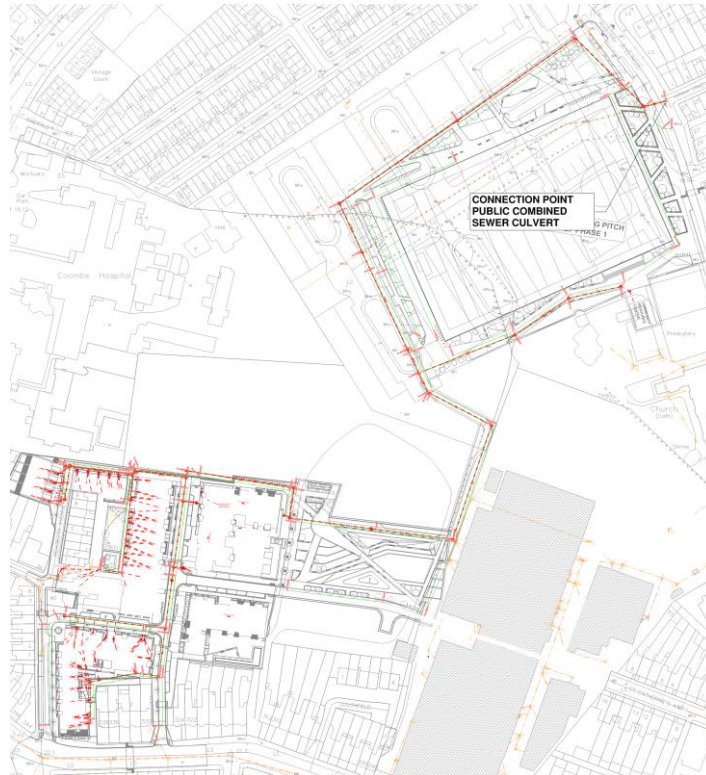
Proposed Waste Water Drainage Connection Point (Extract from Engineering Drawing Set)
